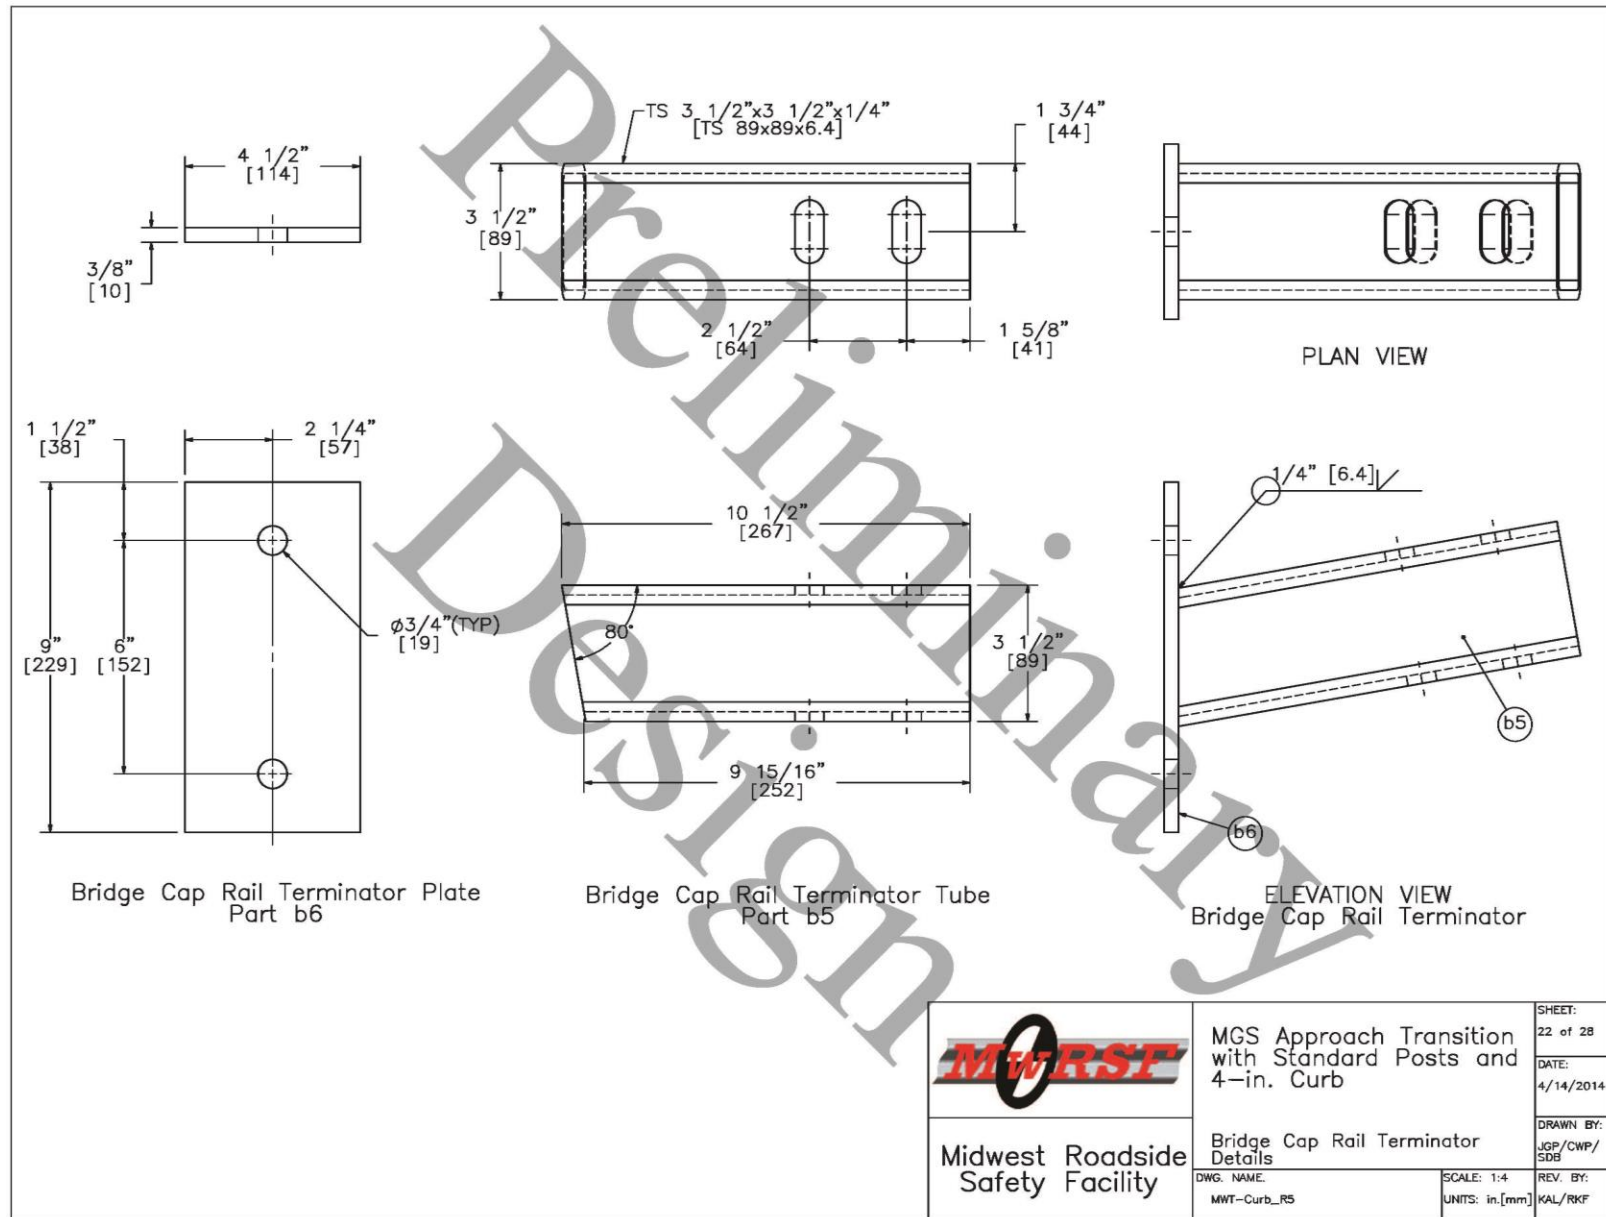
Bridge Cap Rail Terminator Details, Test No. MWTC-1
